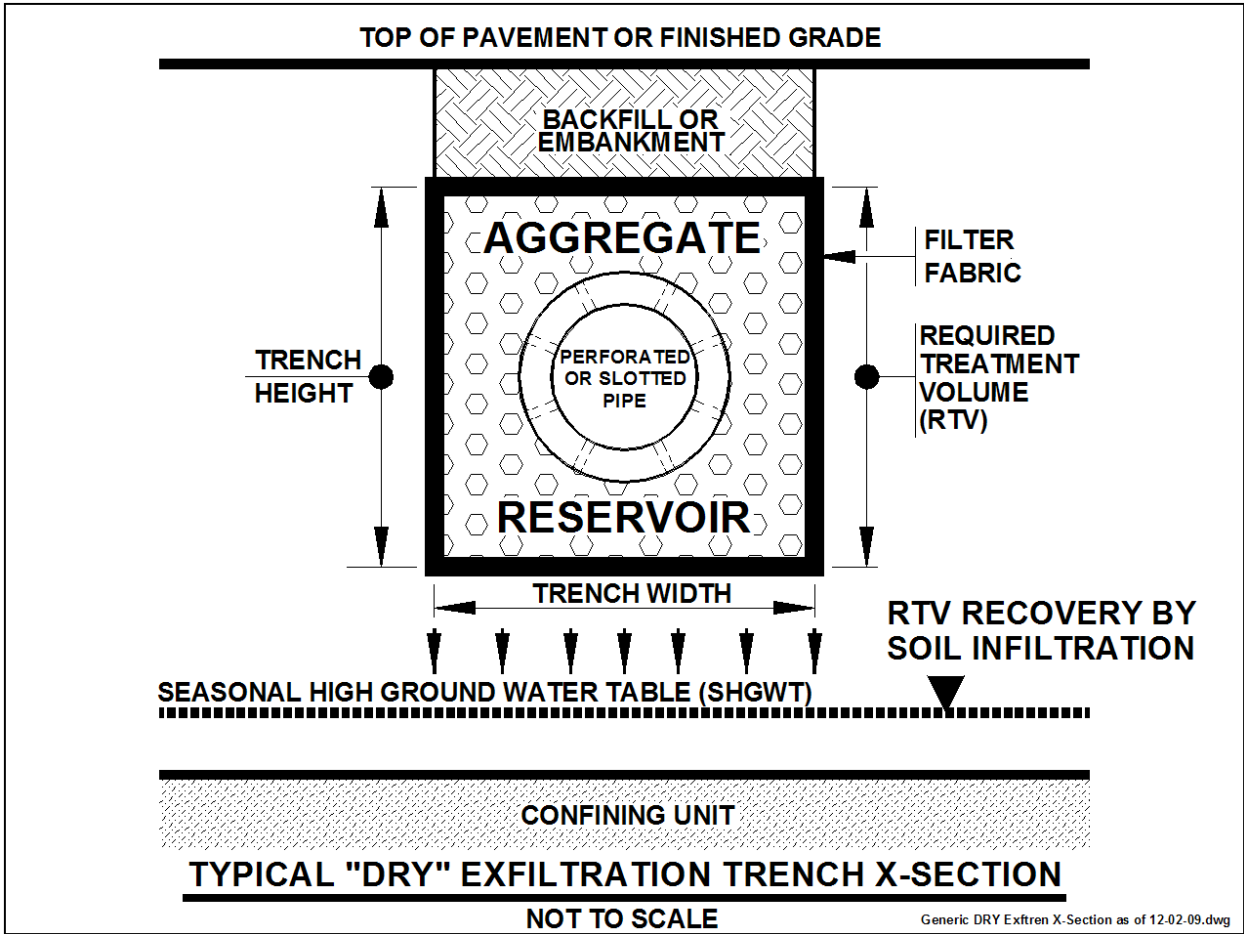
Cross-section of a "DRY" Exfiltration Trench (N.T.S.)
